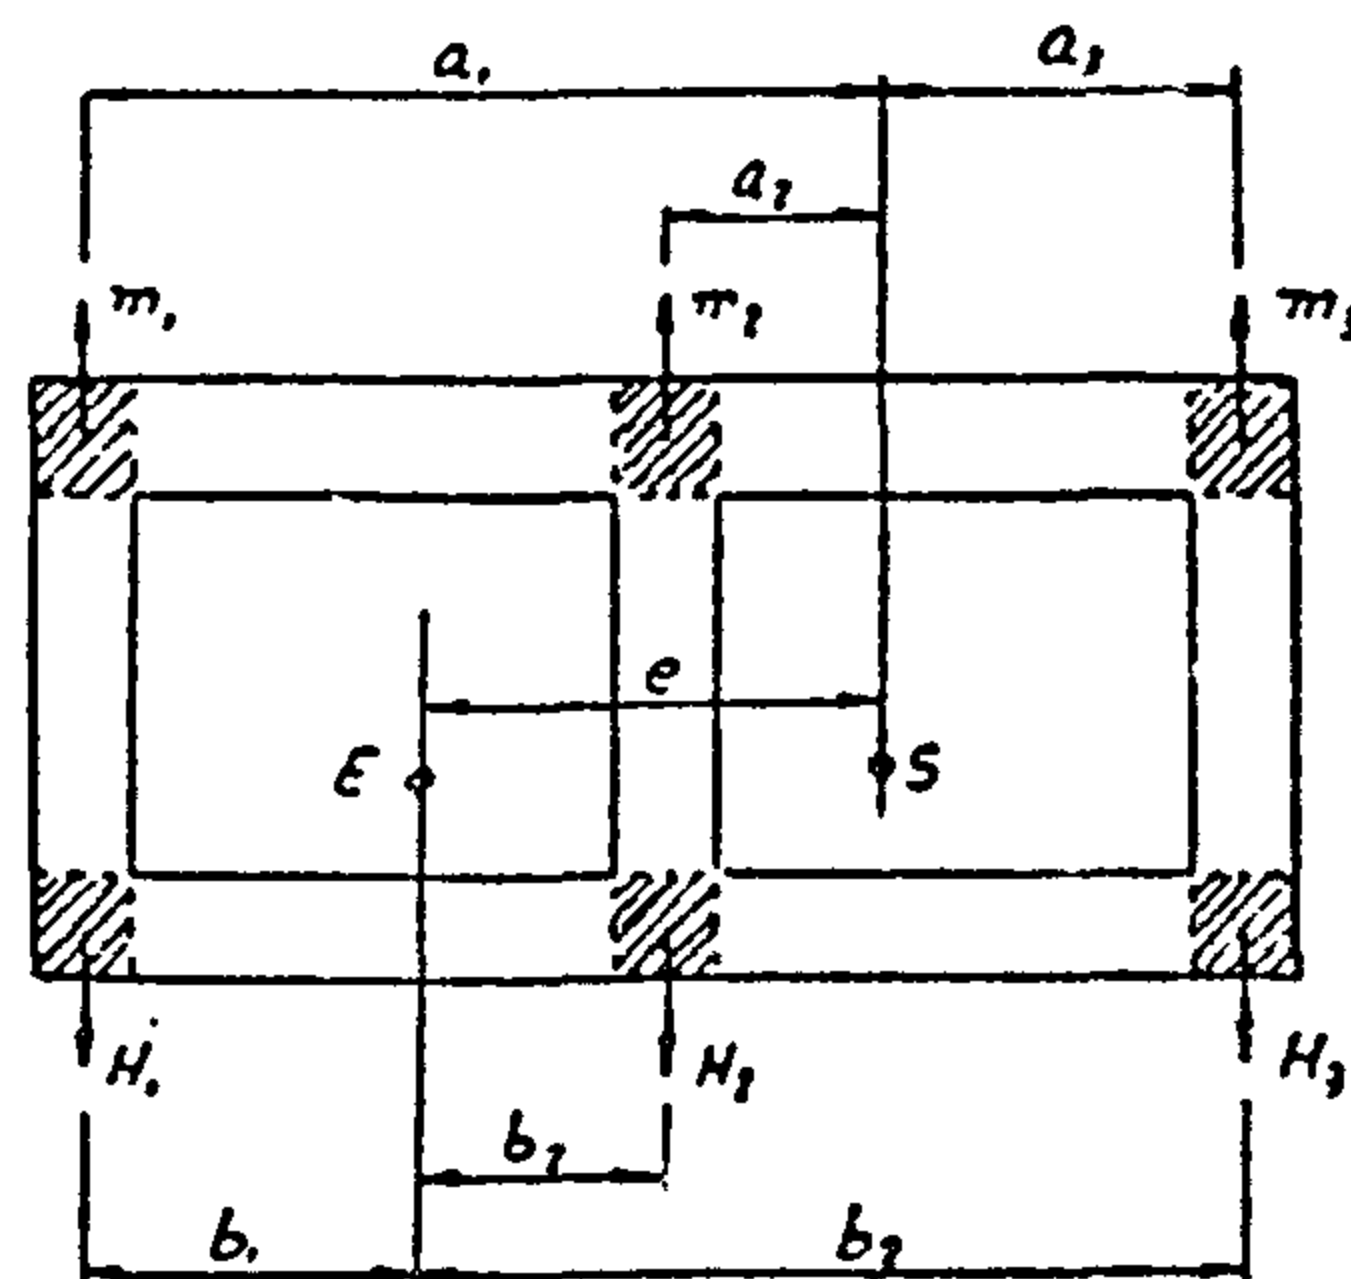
c) Plan Showing Centres of mass & Centre of rigidity.
